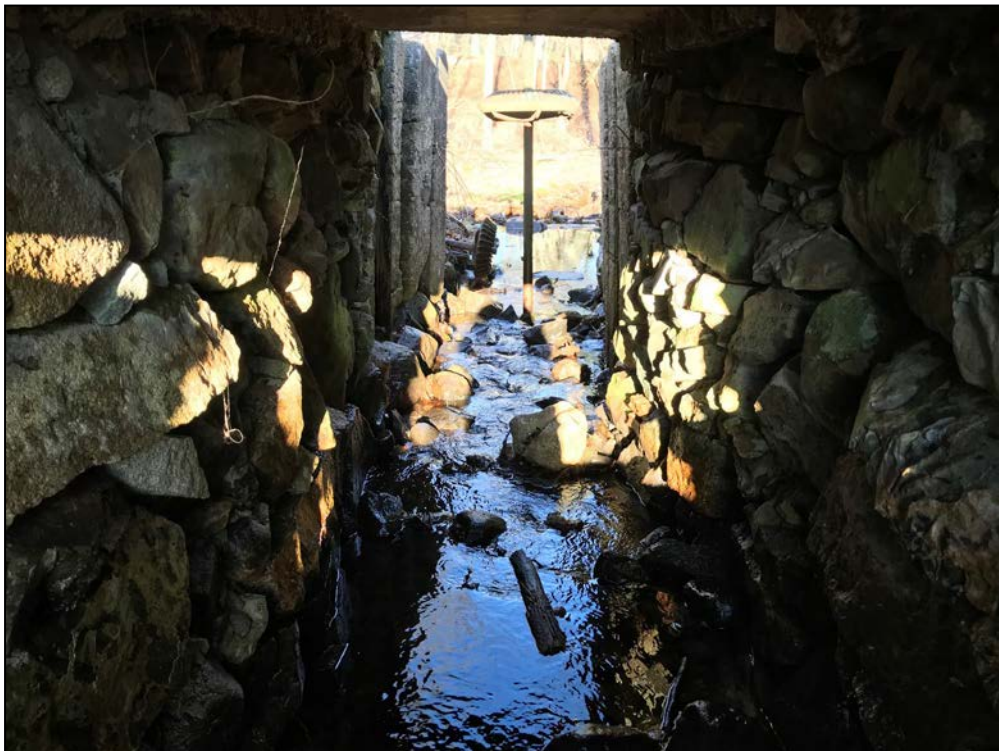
Channel and training walls downstream of the spillway (Note: Stoplog installed to stop flow and allow for inspection).
